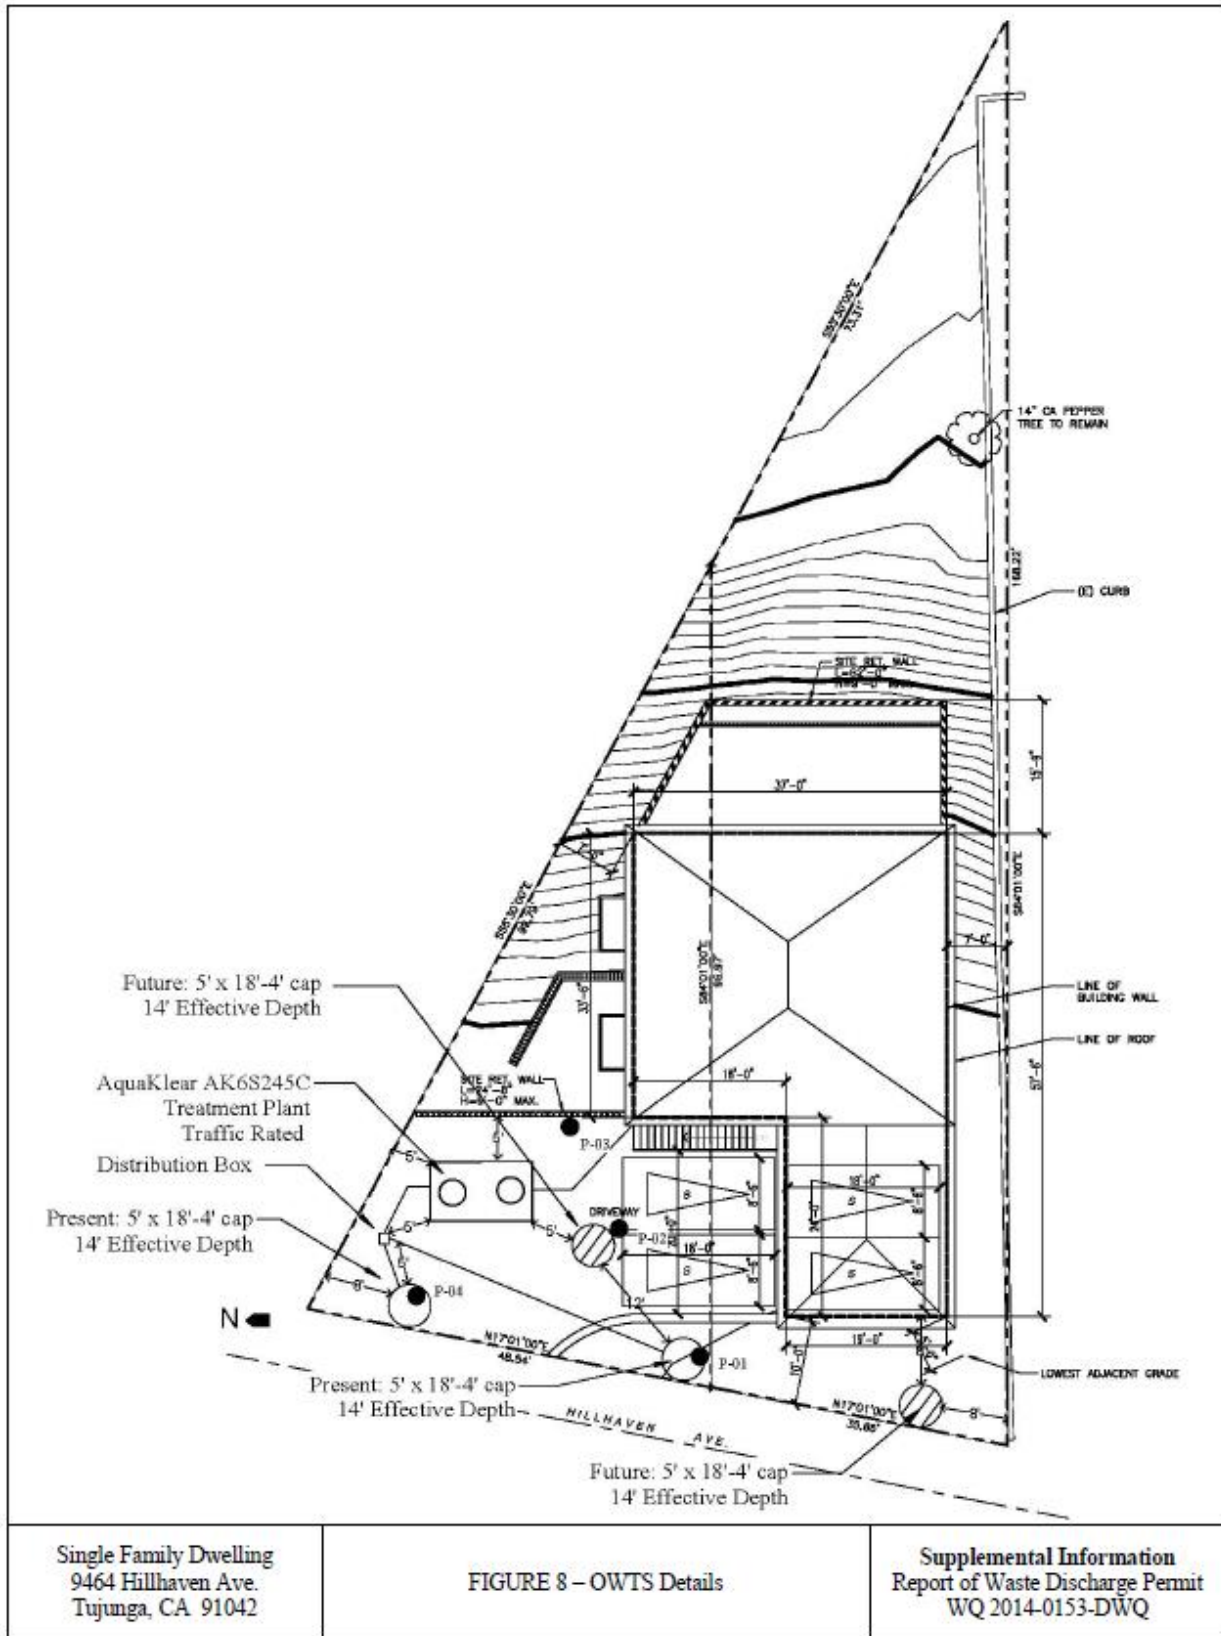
Site Plan of the Bartecek Residence and Advanced Onsite Wastewater Treatment System
